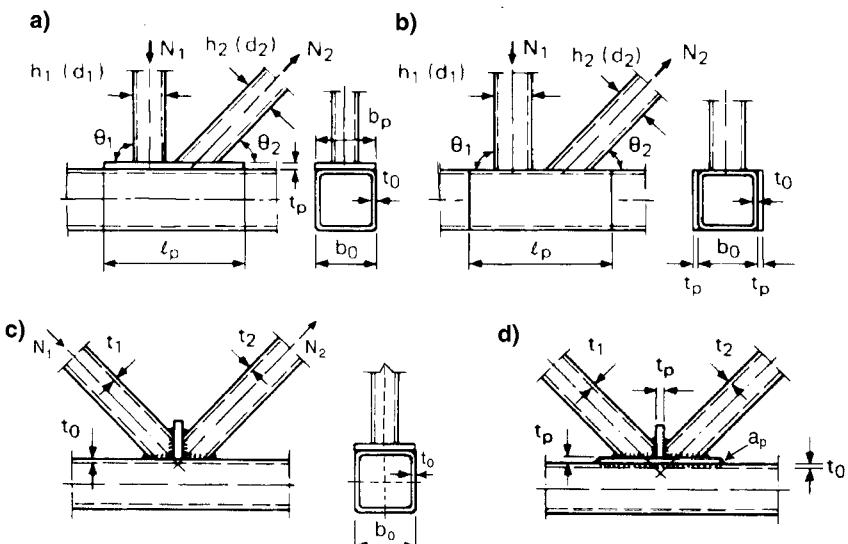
Reinforced truss joints a) Flange plate reinforcement b) Web plate reinforcement c) Vertical plate reinforcement d) Combination of flange and vertical plate reinforcement
